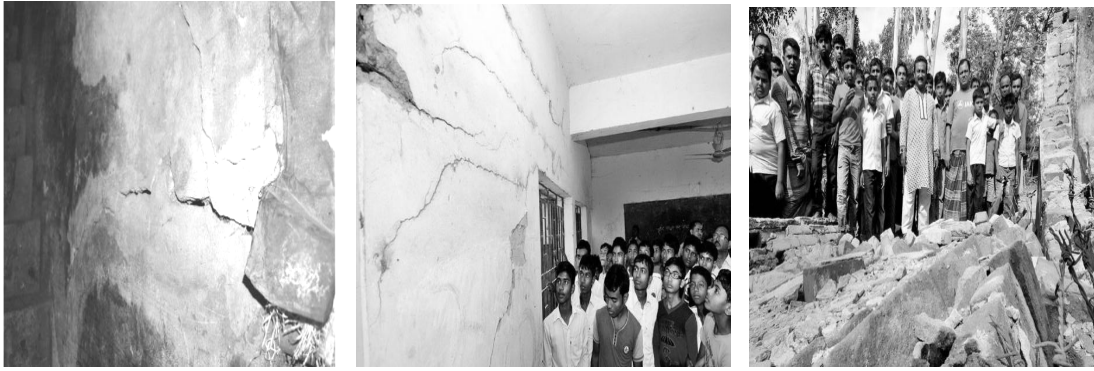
Cracked Staircase, Cracked wall of Primary school & Collapsed boundary wall (“Losses of Earthquake”, 2015)
